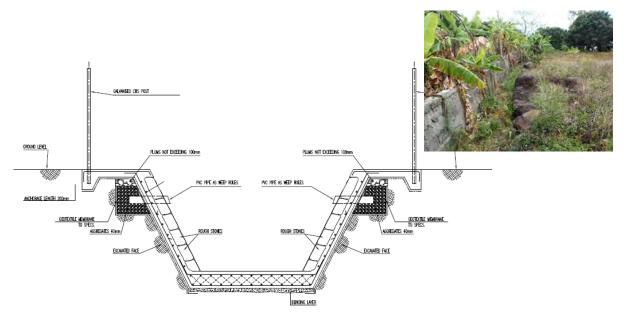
Typical Cross section of Protection of the Existing Water Course (source: JET)
